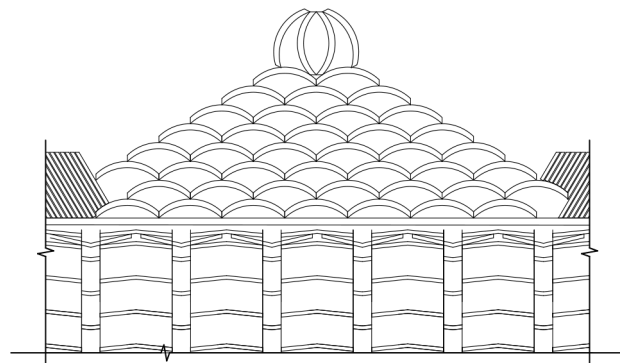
Detail Drawing of the Center of Main Ridge Ornament Scale 1:20
